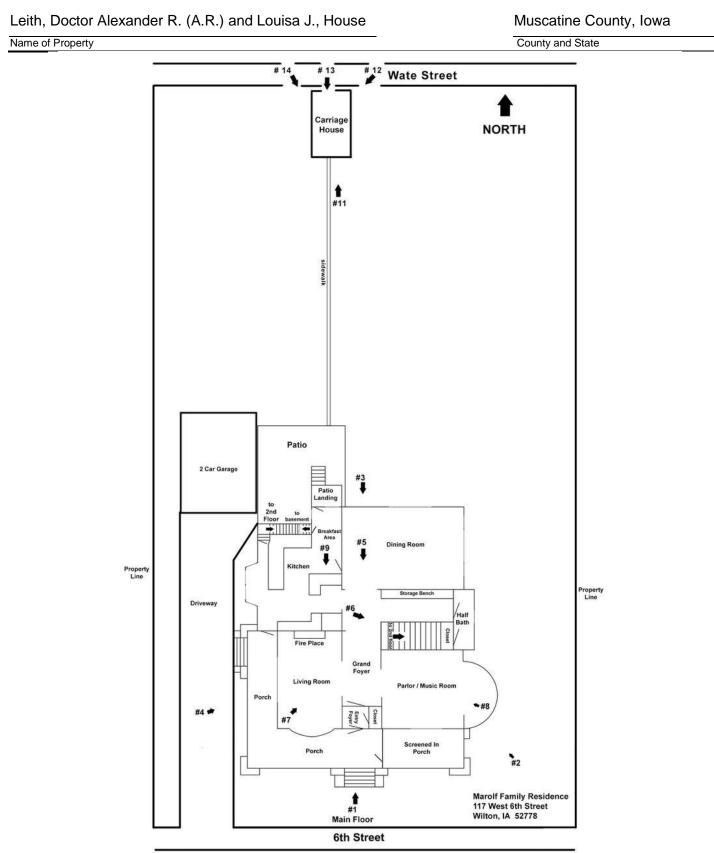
Leith House Floor Plan. Second floor inset on site plan. Carriage House is contributing. Two car garage is noncontributing. Drawn by owner Ted Marolf 8-12-19. Not drawn to scale
